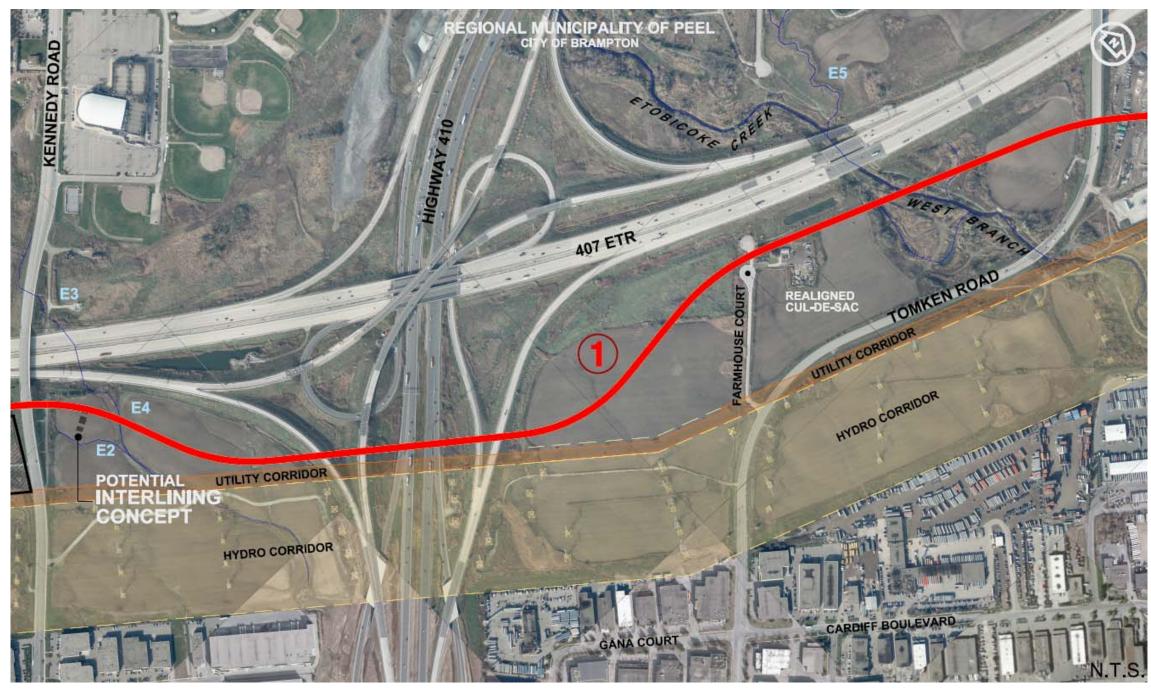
A: SEGMENT B, EAST OF KENNEDY ROAD TO WEST OF TOMKEN ROAD ALIGNMENT ALTERNATIVES
